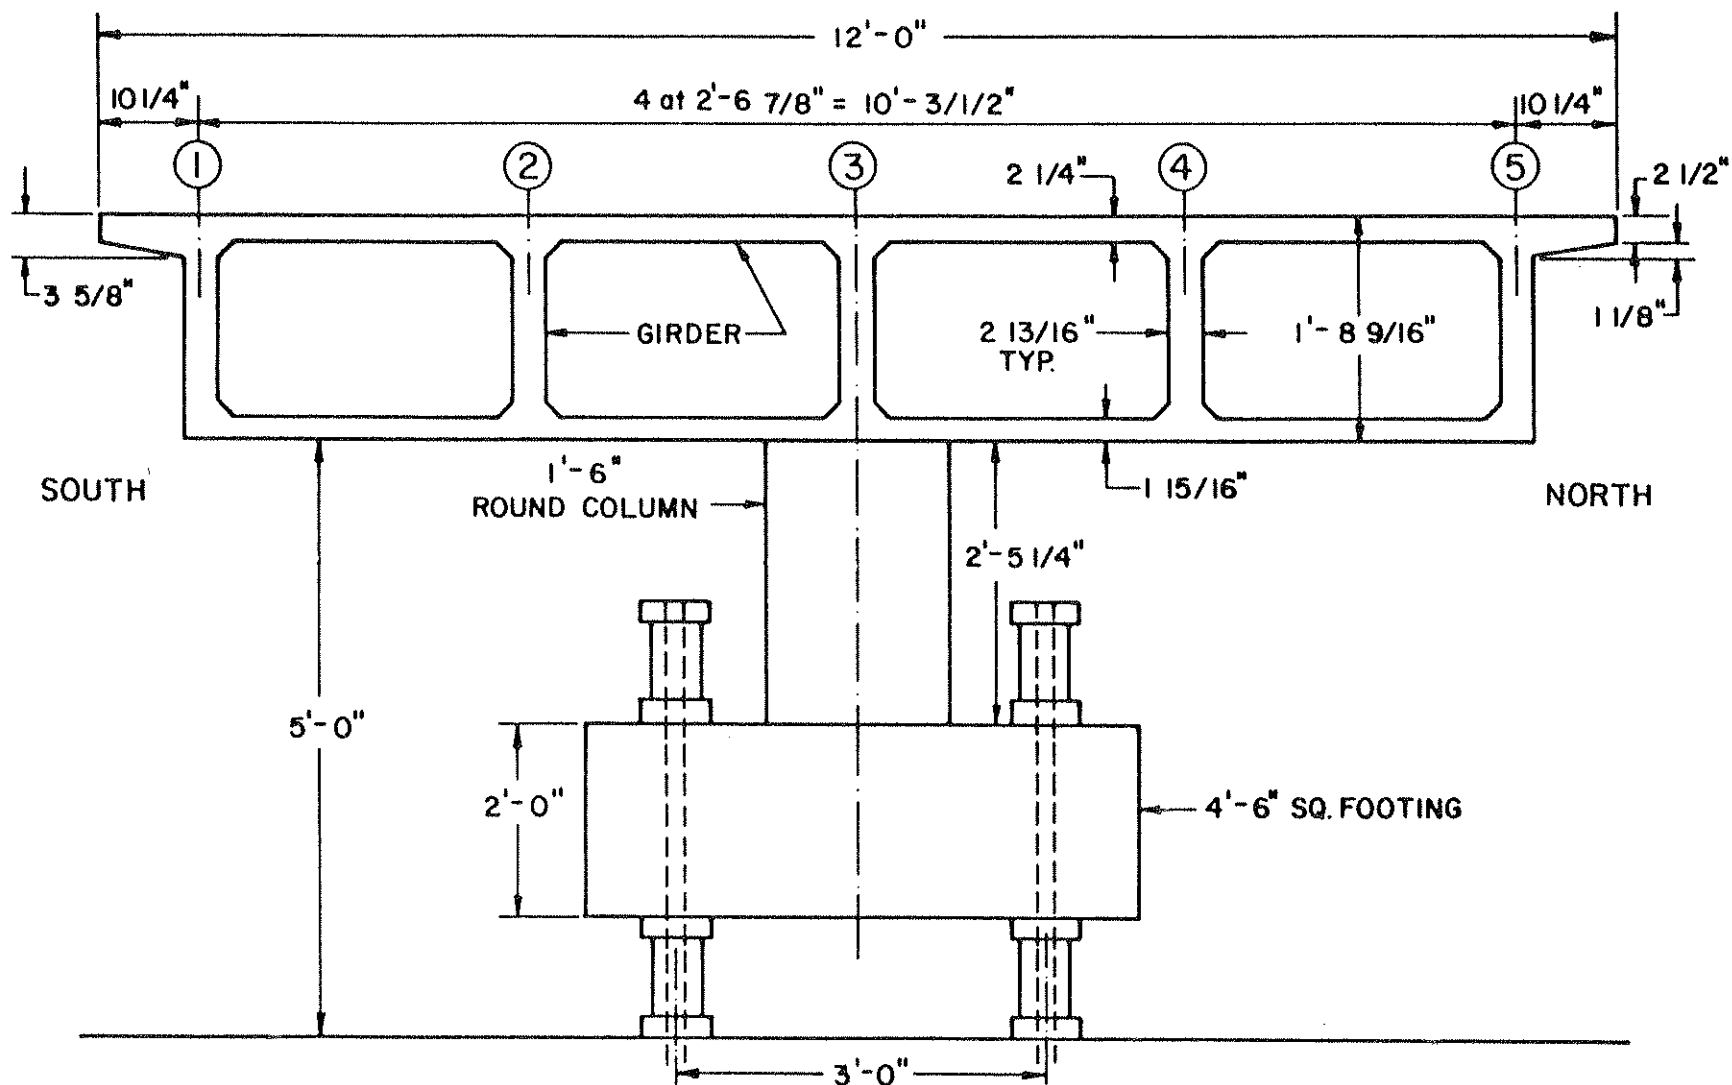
TYPICAL SECTION OF BOX GIRDER BRIDGE MODEL
